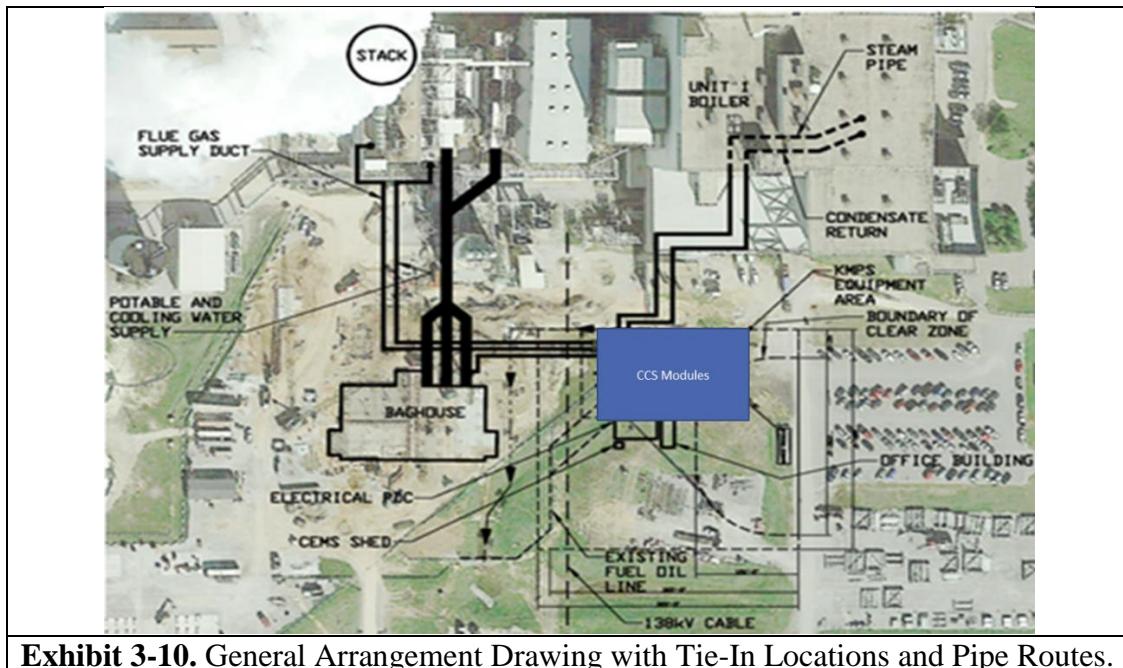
General Arrangement Drawing with Tie-In Locations and Pipe Routes.
